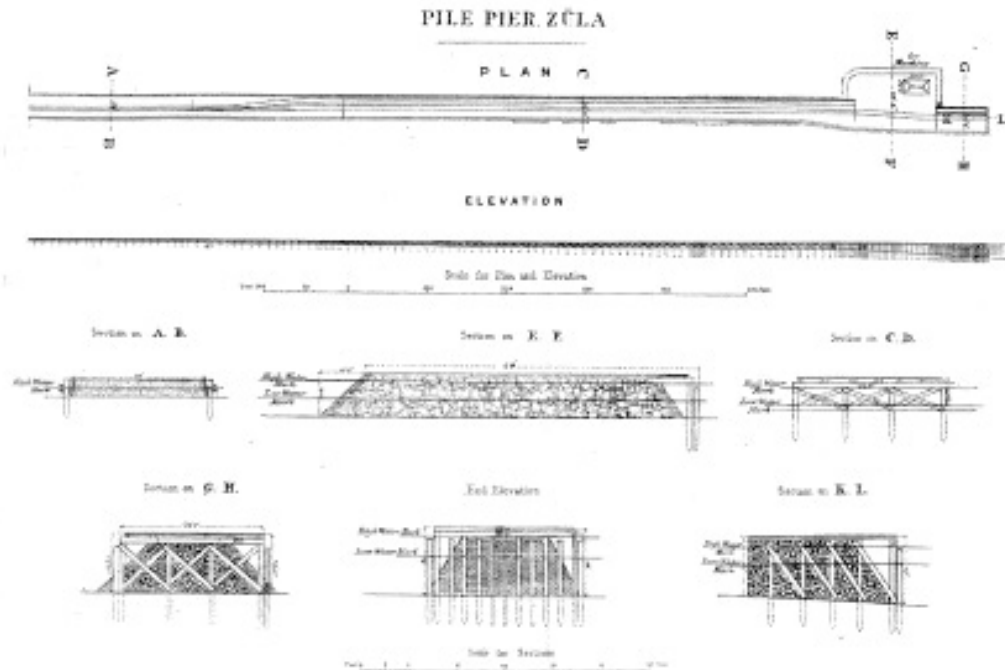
The construction of Napier's disembarkation pier (from Holland and Hozier 1870)
